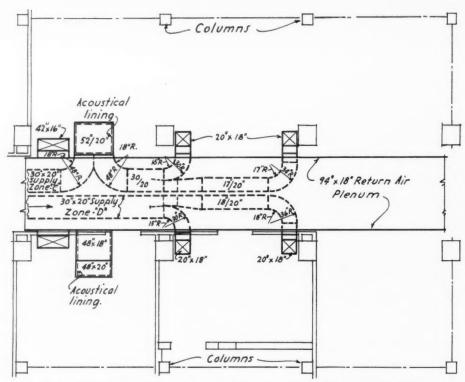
Section in basement showing a typical air conditioning apparatus group; one half the conditioned air supply system leading from the apparatus and a section of the large return air plenum which runs through the basement. Each conditioning group draws its return air from this common plenum.
